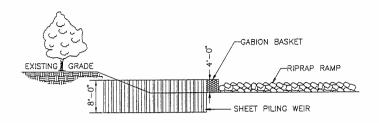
B KUHN DITCH SEDIMENT TRAP DETAIL
